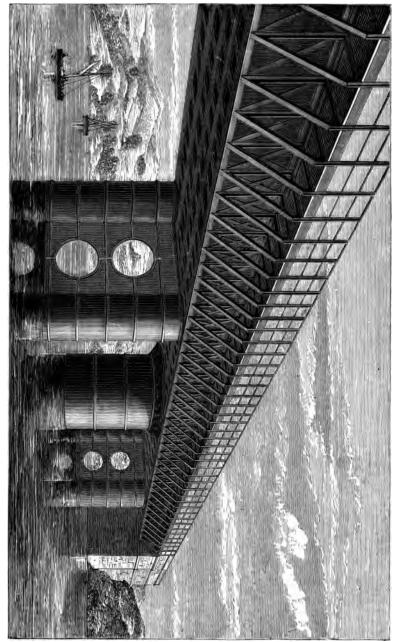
MURRUMBIGEE BRIDGE, AT HAY, AUSTRALIA.
